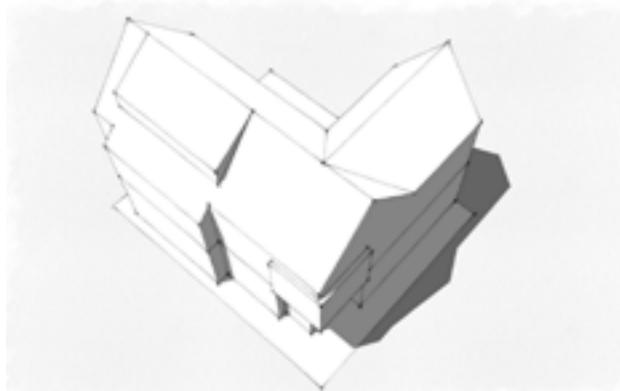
Smaller apartment buildings may be used to contribute to the character of a street elevation and/or add variety and mix of unit types within a block.
